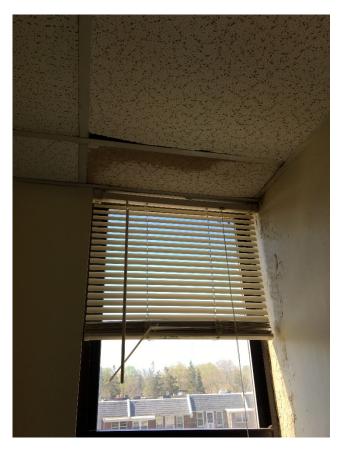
Water-stained ceiling tile and water-damaged wall - Bala Nursing Center
